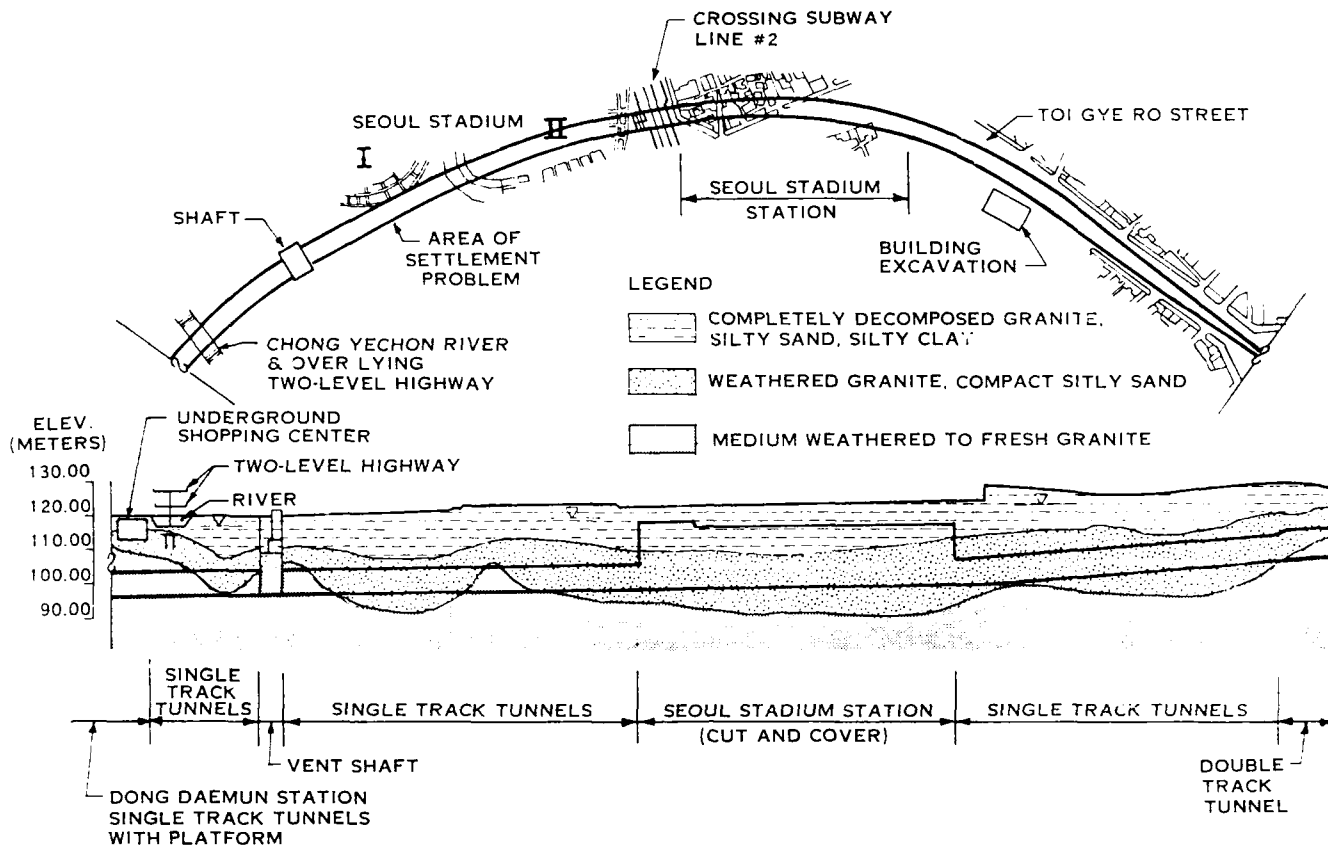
SECTION 413 PLAN AND SUBSURFACE PROFILE.
